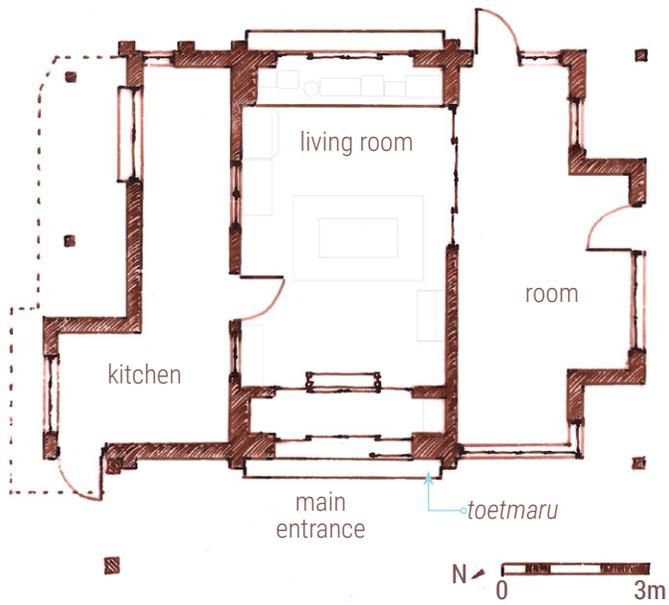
Floor plan created based on the exterior spaces depicted in the drama.
